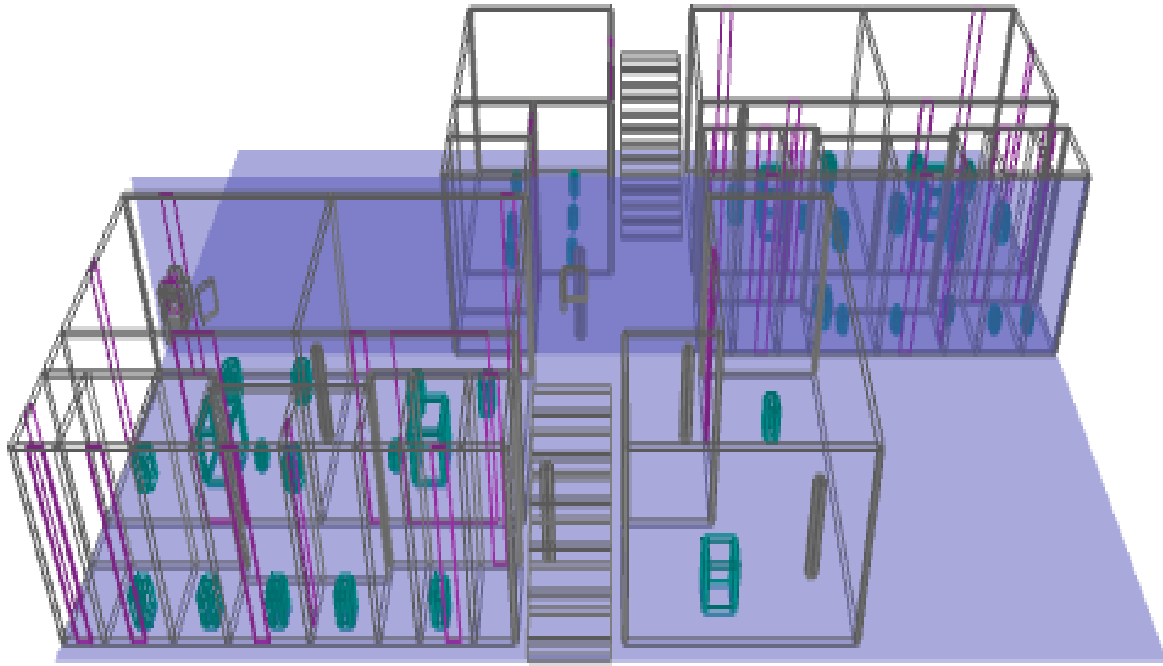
A 3D indoor building floor has been drawn on WallMan with indoor materials.
